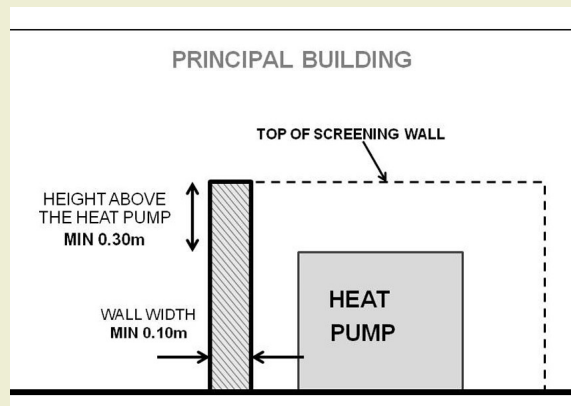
Town of Comox Zoning Bylaw Figure 5-4. Section view of Heat Pump side yard screening
